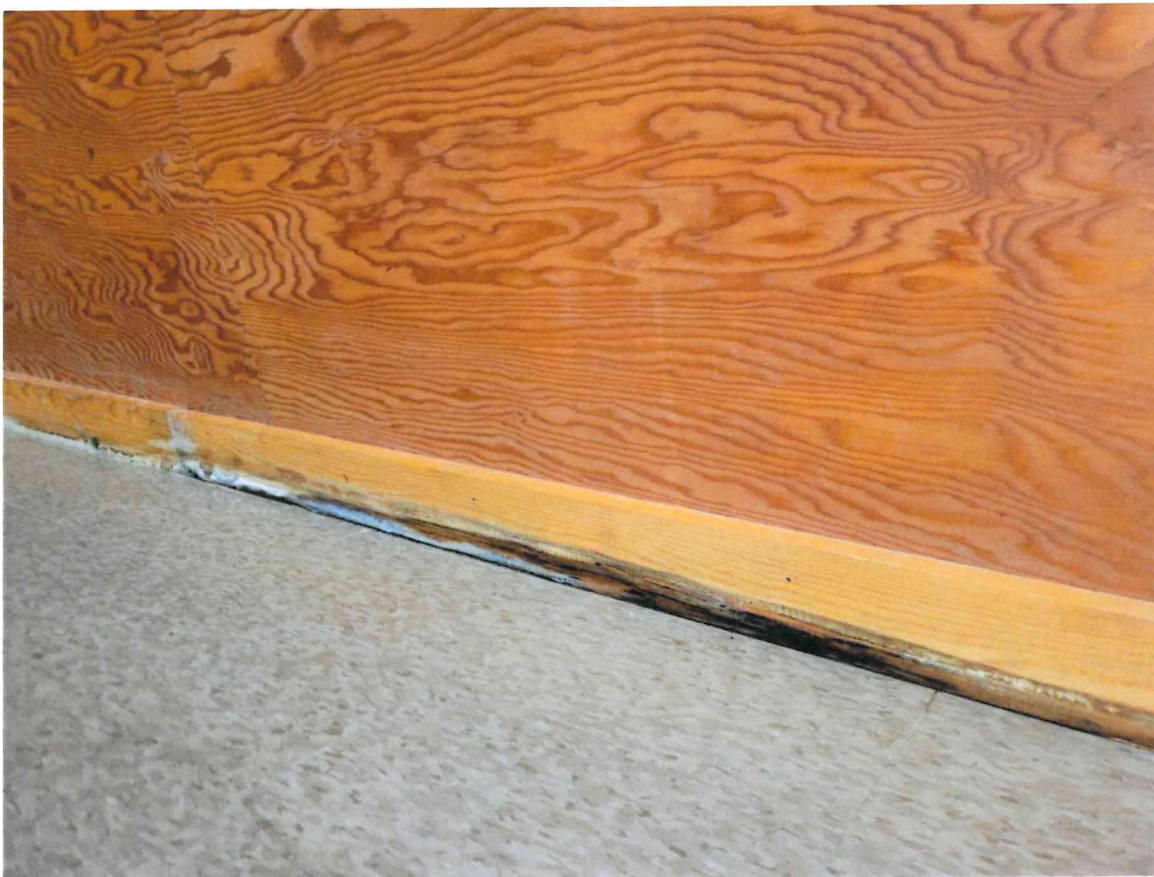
Visible water damage and spotting on wood baseboards and walls in the gym (moisture content 23-80%).
